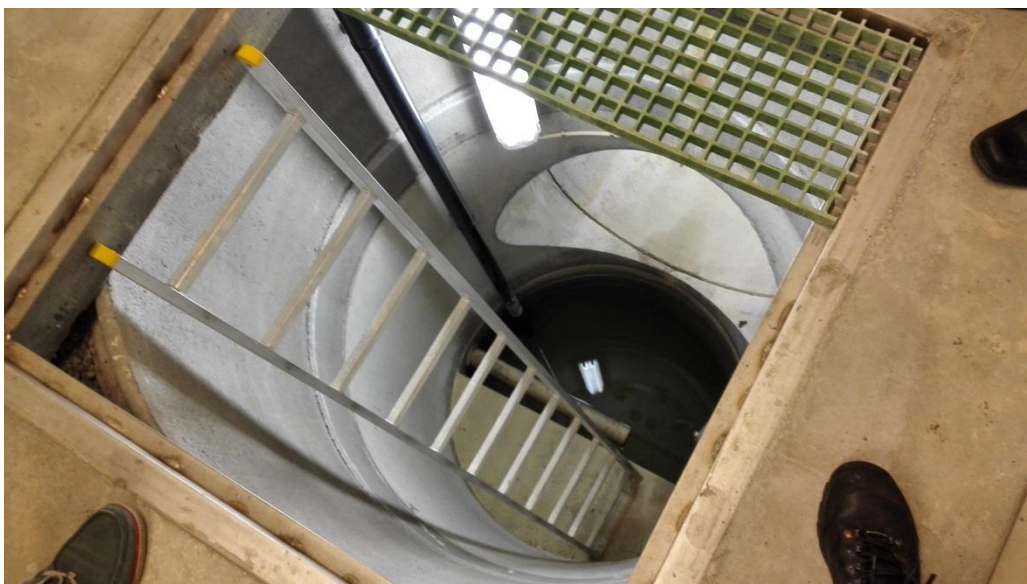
Manhole in connection with the detention basin (Photo: Jens H. Trandem)
